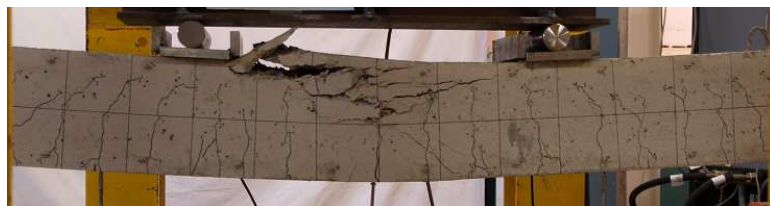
Typical concrete crushing failure (Beam C1-212-D1-A).
